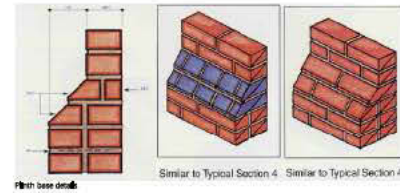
PROPOSED HOUSE TYPE 4
